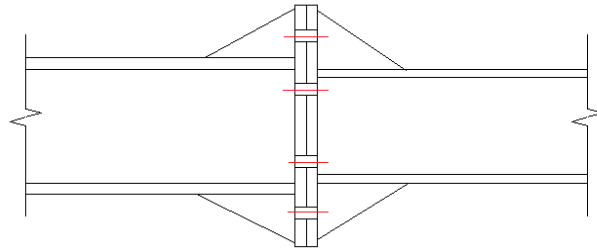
Schematic view of Specimen #9, (32mm end-plates with 14mm gussets)
